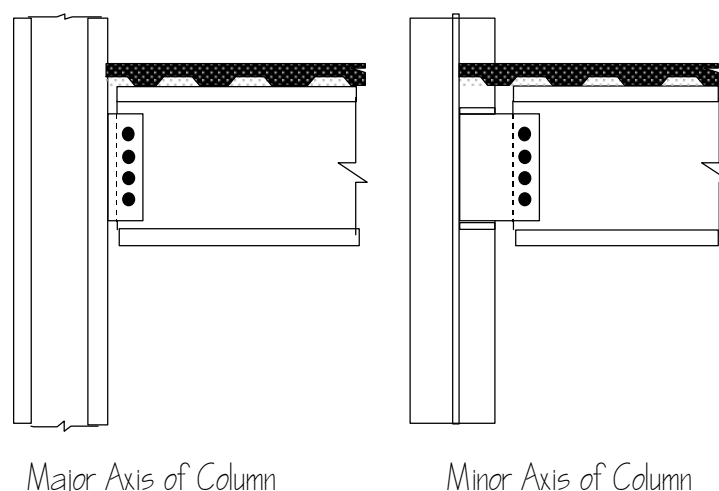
Typical Simple Shear Tab Connection with Slab
